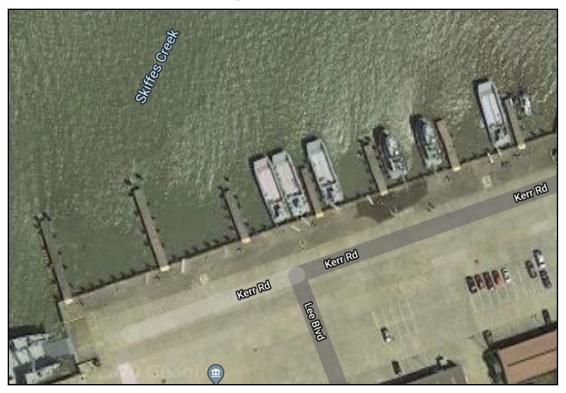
Existing finger piers, numbered 8 – 14 from west to east.
